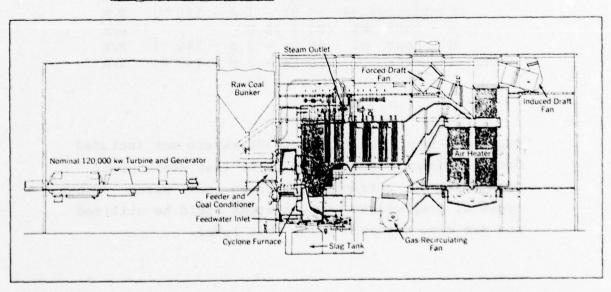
Typical design of a 120 MW coal fired steam power plant - Babcock & Wilcox Co.
